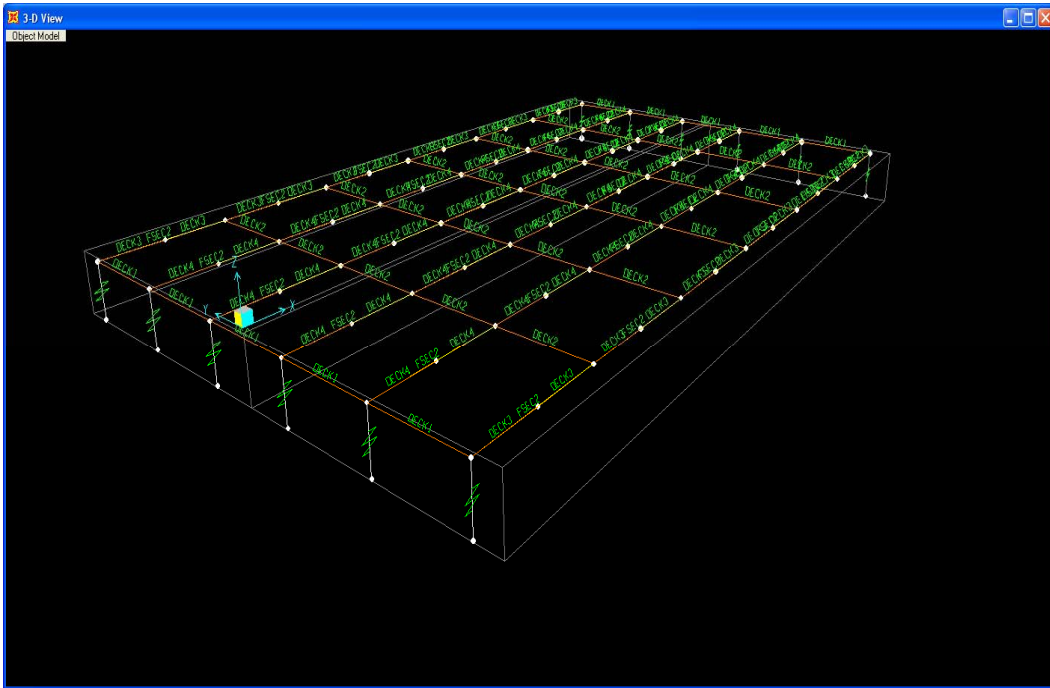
Grid of Deck Frame Elements for PC Beam Bridge
